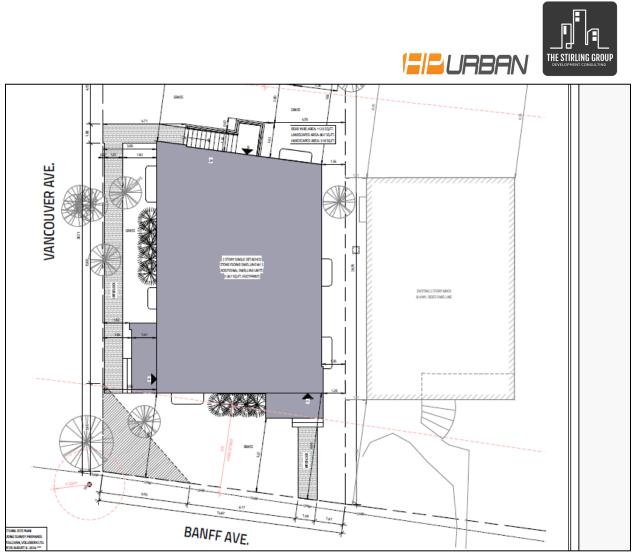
Proposed dwelling orientation in relation to neighboring dwelling at 1977 Banff Avenue
